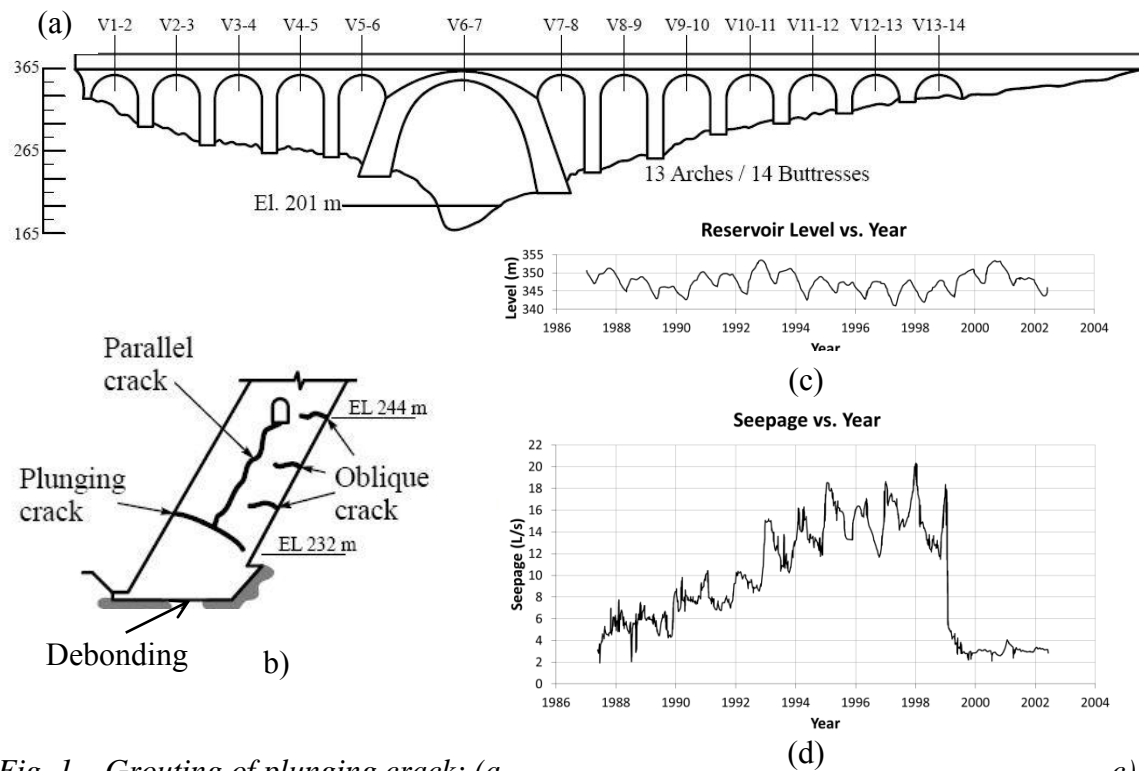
Grouting of plunging crack: (a) reservoir level, (d) seepage Arch 5-6.
